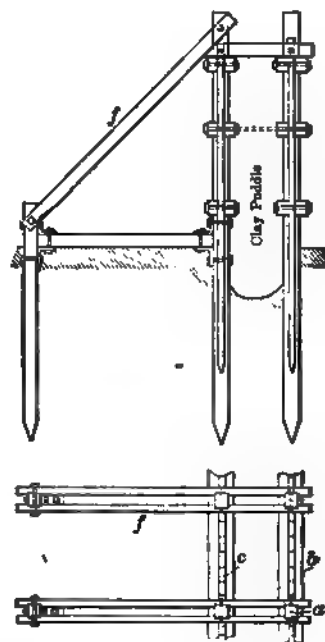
COFFER-DAM WITH INCLINED BRACE.
